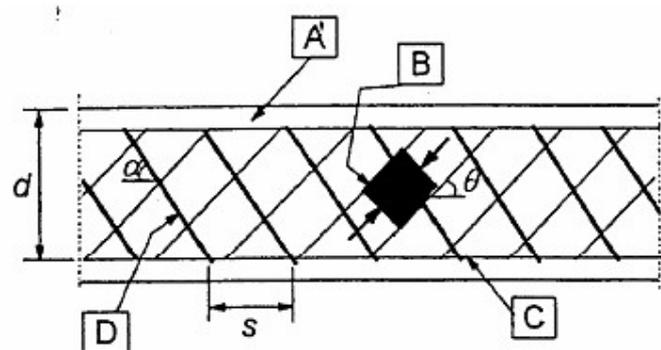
Truss model of the calculation state in the supporting area of RC beam [2]: A—compressed chord; B—compressed struts; C—tensile truss chord; D—tensile struts.
